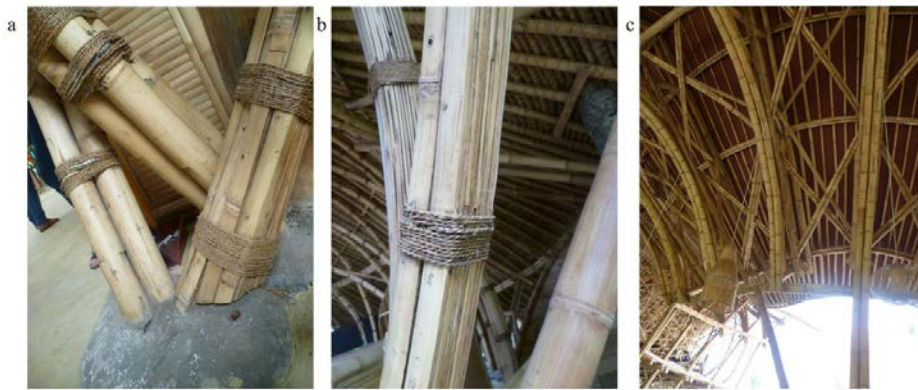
Structural details; (a) Bamboo split method and bamboo bundling; (b) Bamboo split details; (c) Detail of arches using bamboo bundling.
